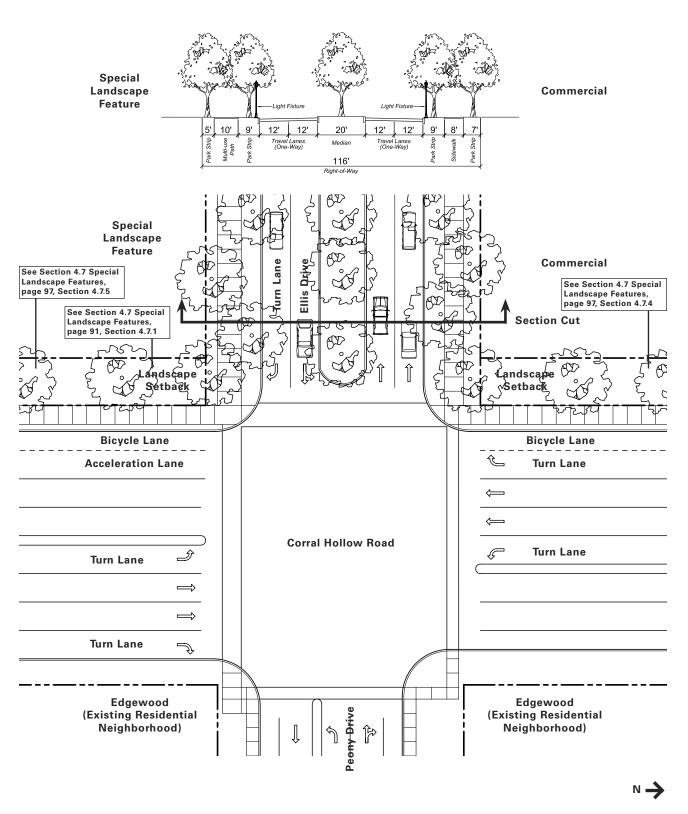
Proposed Section and Plan: Entry Street C (Ellis Drive)
